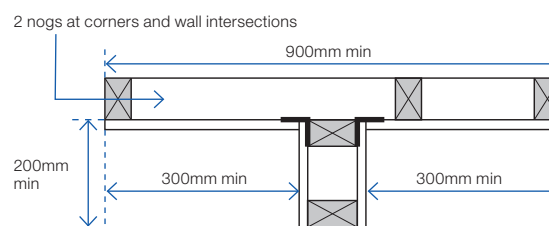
CORNER INTERSECTION (GIBFix® FRAMING SYSTEM)
